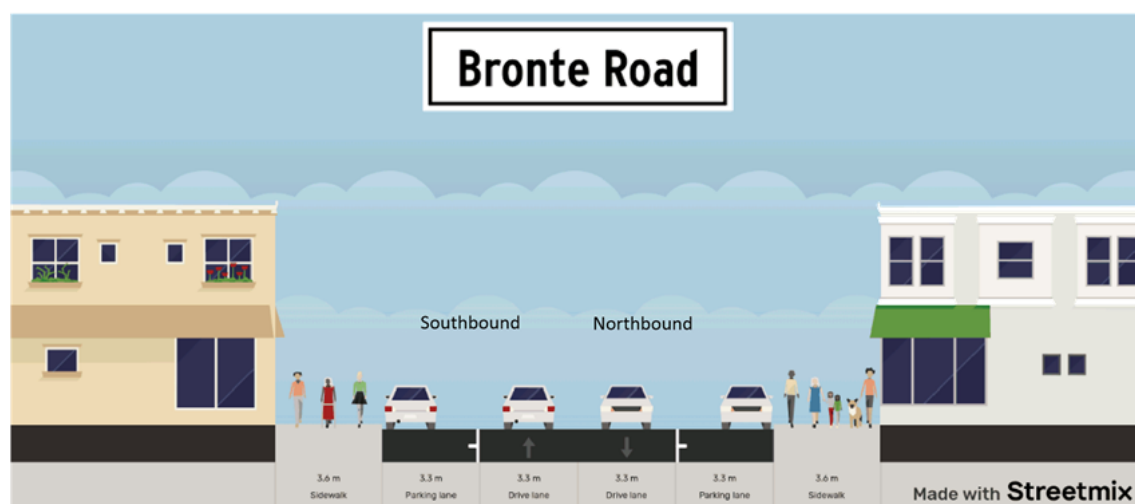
Cross Section of Existing Bronte Road (239 Bronte Road)
